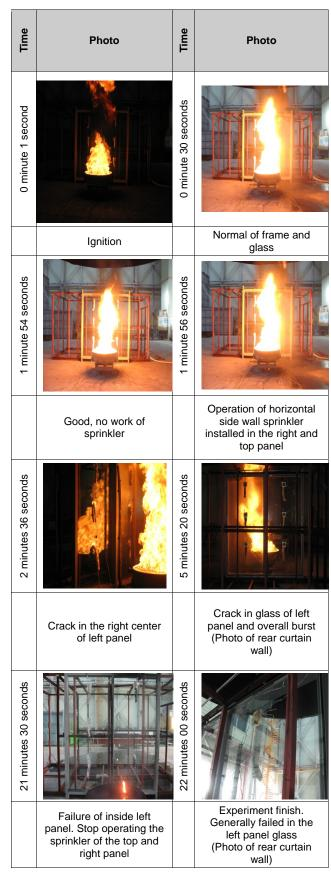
Process of curtain wall failure by the full-scale experiment
